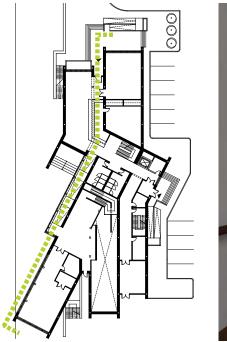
Plan (Main Floor) Illustrating Section Through Ramping Condition
